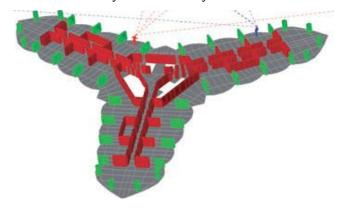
Tri-axial 'Y'-shaped plan of Burj Khalifa
